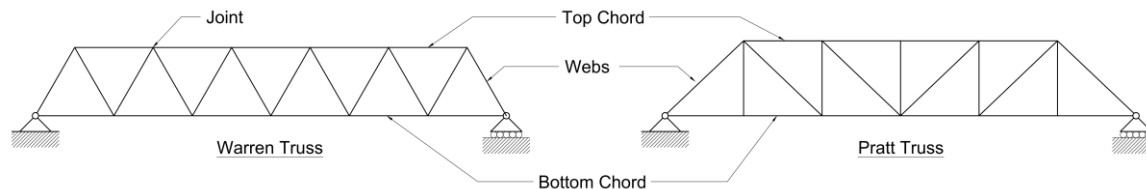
Examples of common truss designs: Warren truss (left) and Pratt truss (right)
